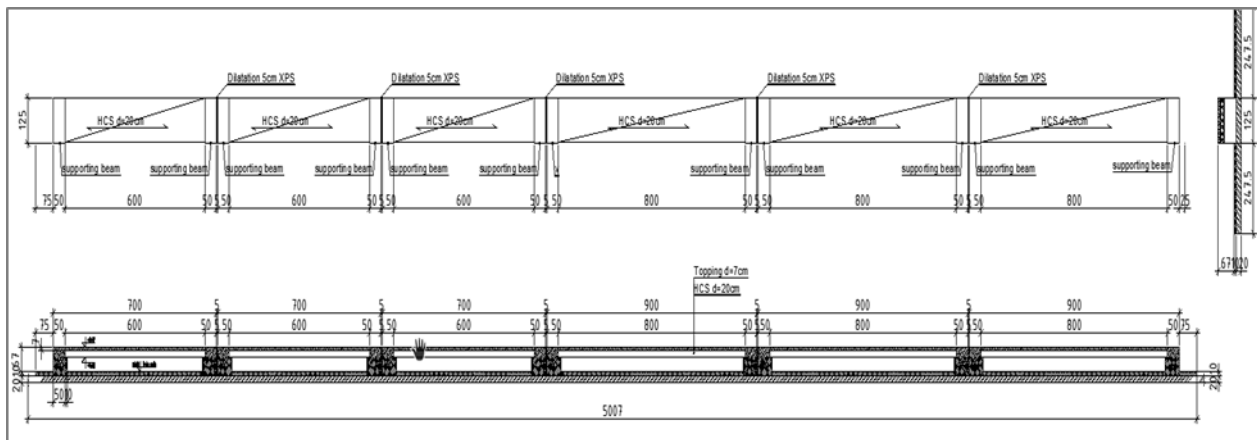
Disposition (floor plan and vertical section) of the VS models
